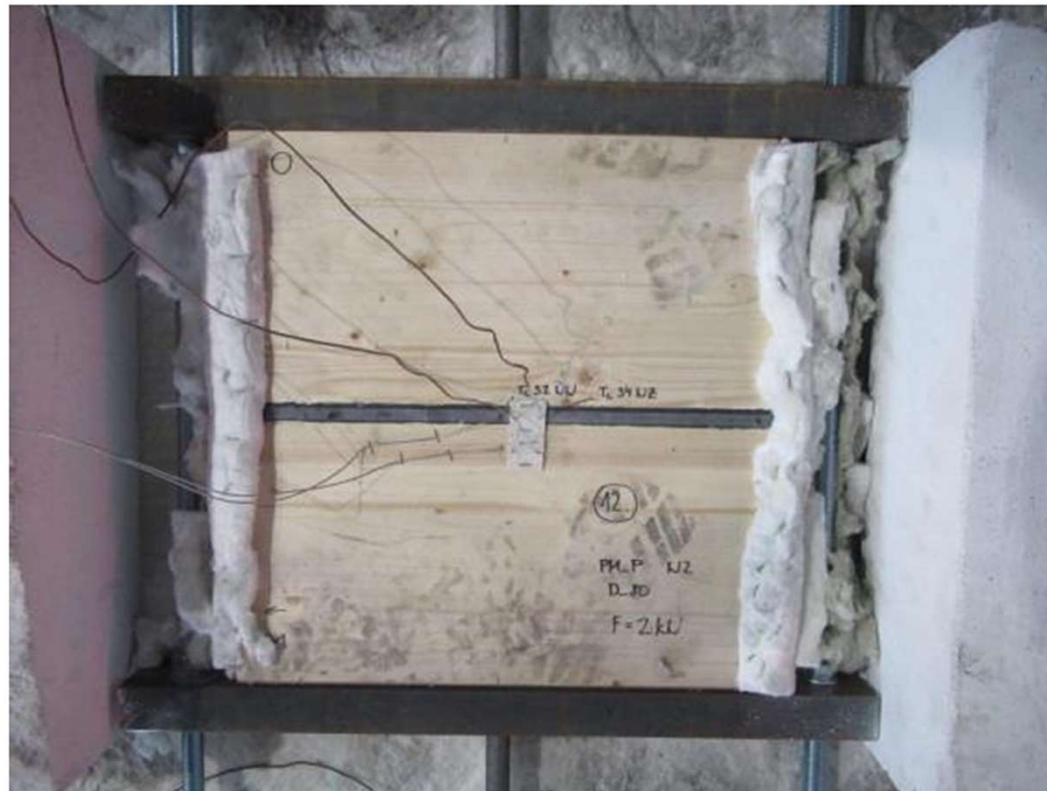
Thermocouple placement in specimen no. 12 (photo archive 049506d-270)
